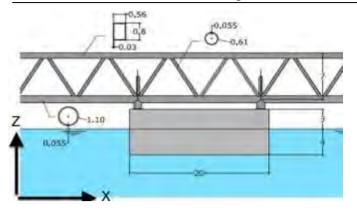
Typical pontoons and truss girder inspired from the Bergsøysundet bridge.
